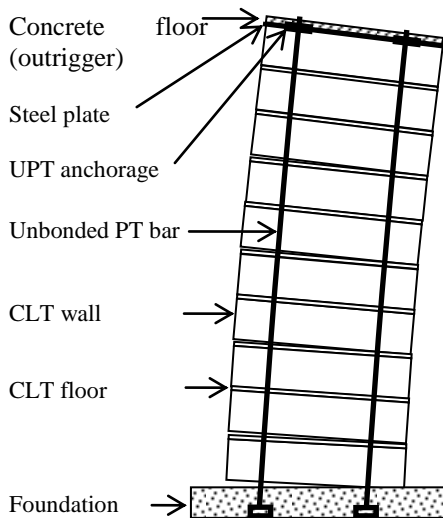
Unbonded post-tensioned CLT wall under lateral loads
